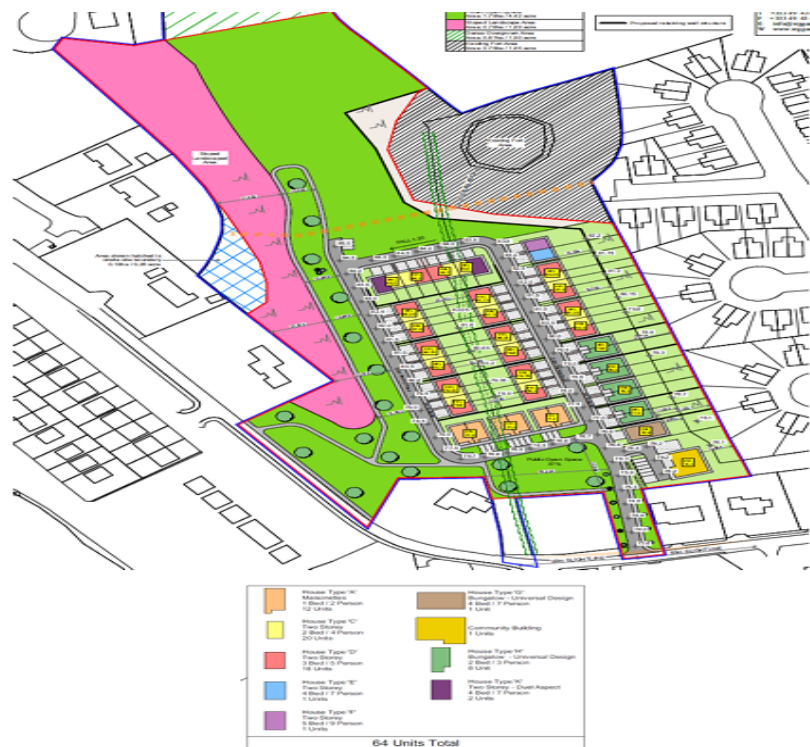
Proposed Site Layout at Swellan Lower, Co. Cavan.
